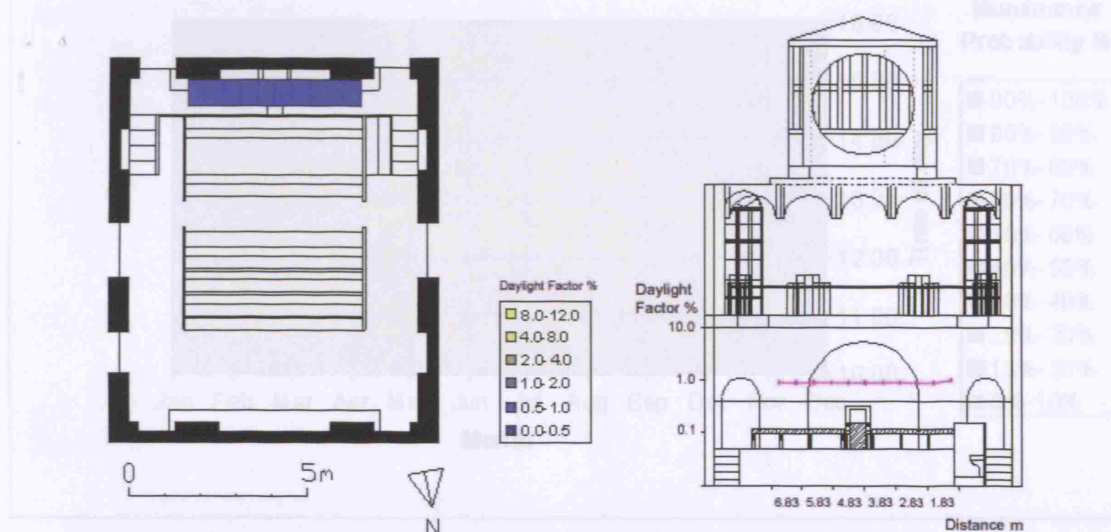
Court of Chancery Horizontal Daylight Factors at 1.85m, Plan and South Section
